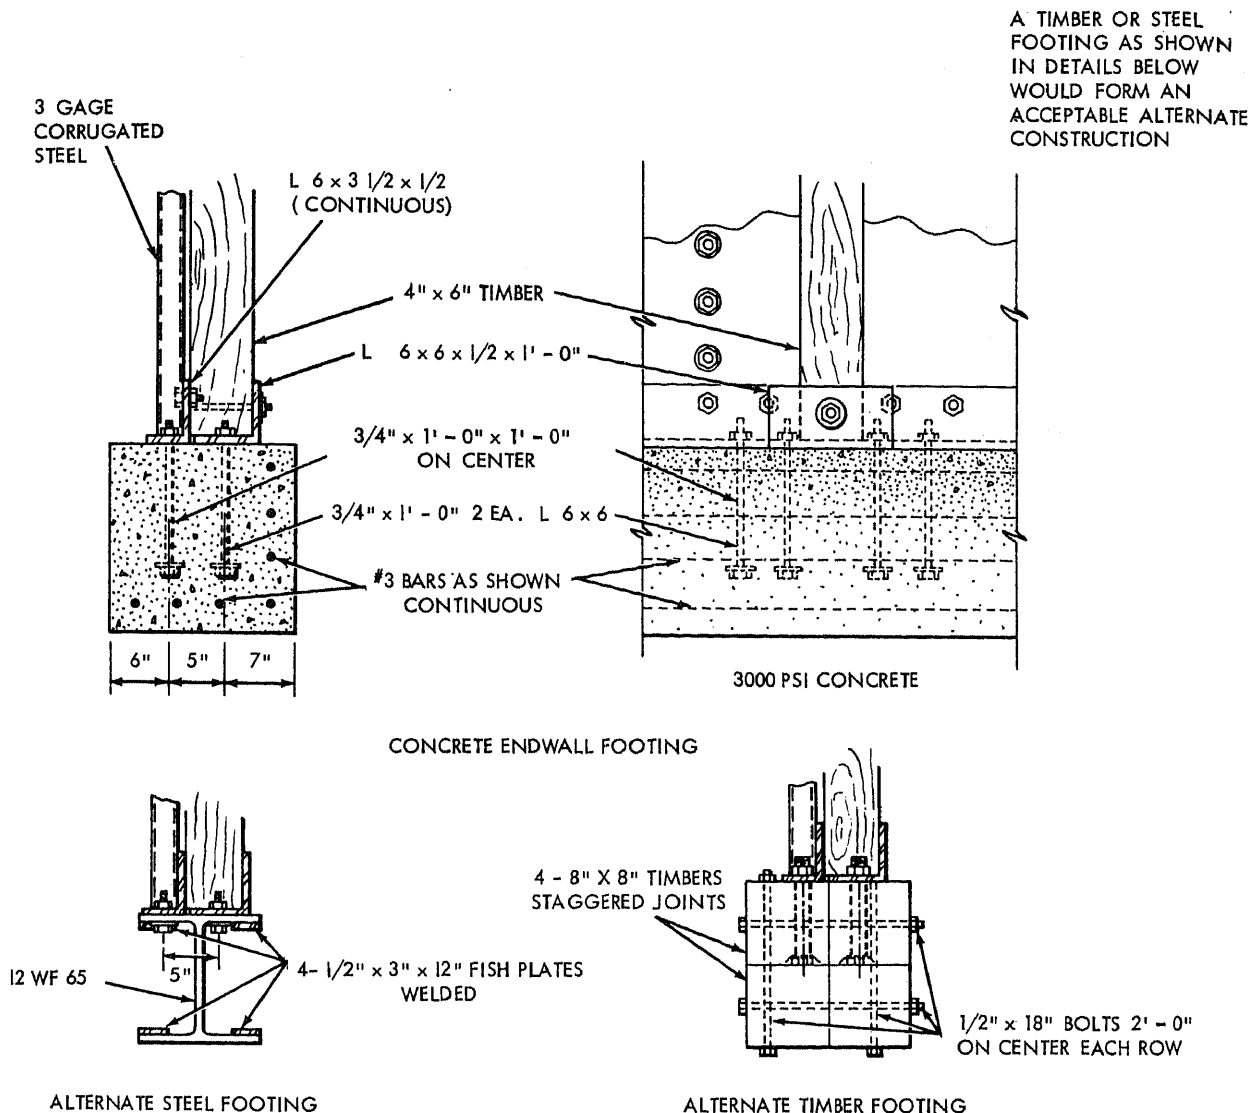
Structure- and deadman-supported endwall suitable for 50 psi. Footing details.
